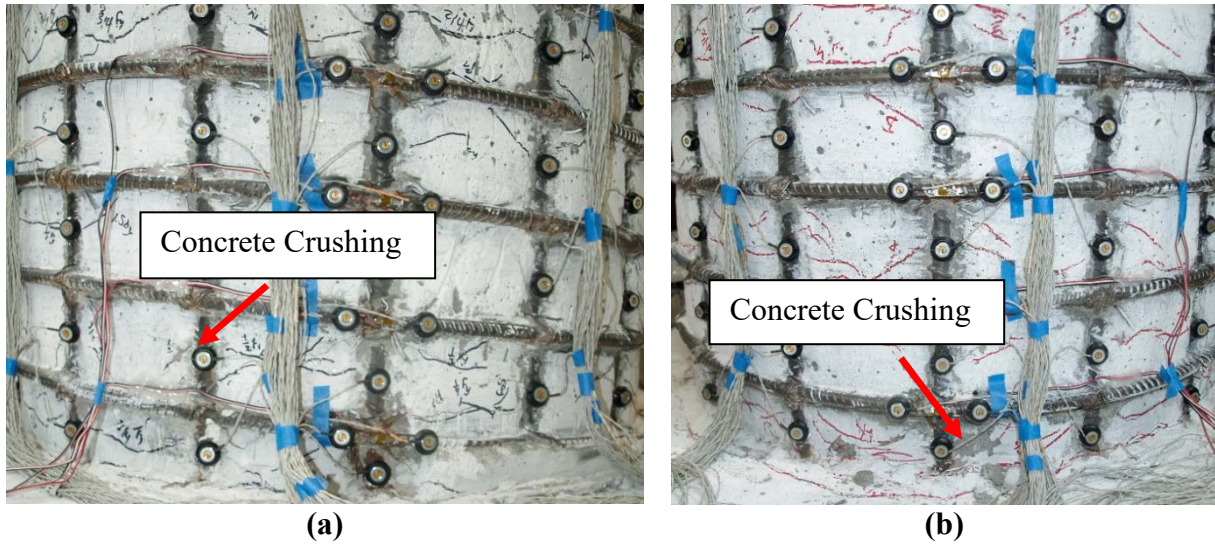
Concrete crushing ($\mu_{1.5}$): (a) South; (b) North
